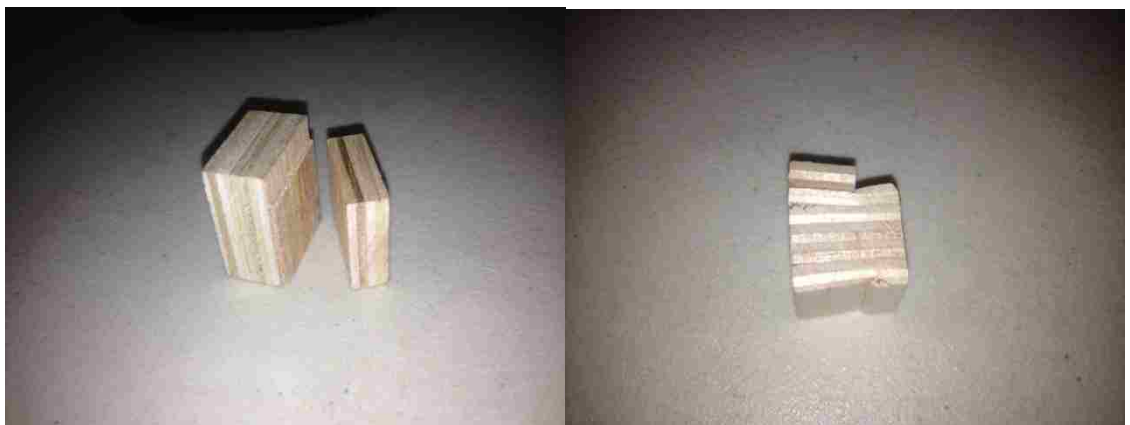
Figure J. Failed Specimen in Shear Parallel Test (Left), Perpendicular Test (Right).
